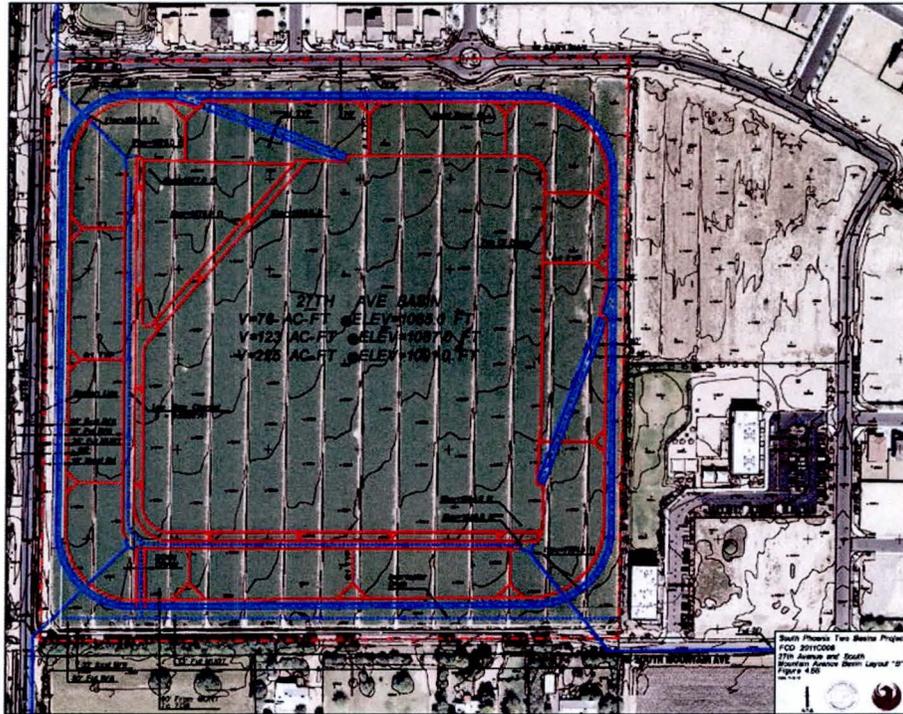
27<sup>th</sup> Avenue and South Mountain Avenue Version “B” Layout
